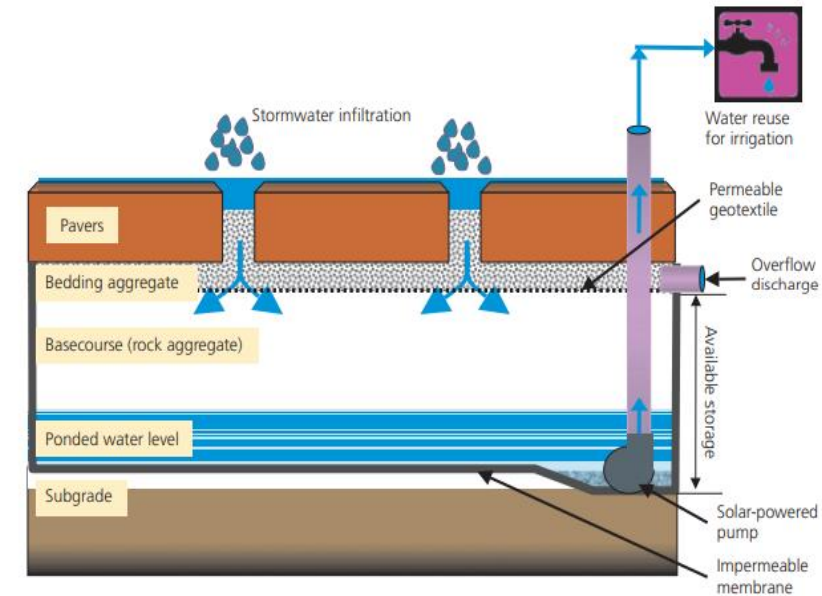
Permeable pavement system with water reuse capability (adapted from Myers et al. (2009a))
